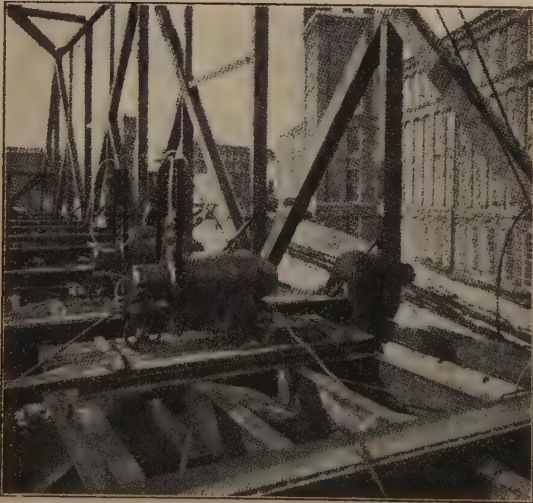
Two 200-ampere, one-man welding units accomplished all of the welding work.
